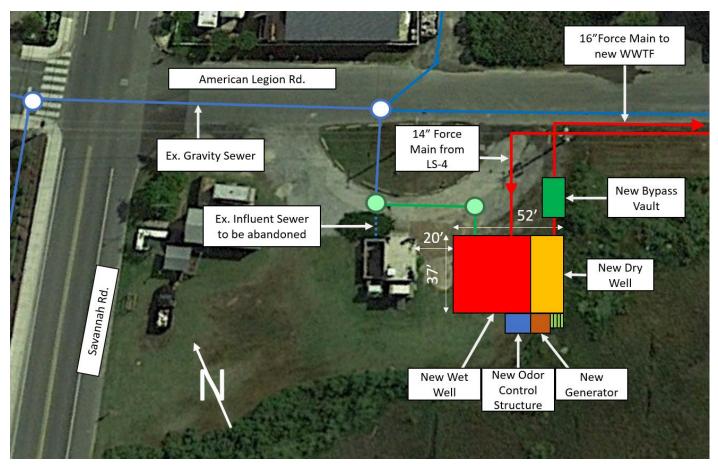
Options 2a/b/c, Raw Wastewater Pump Station, LS-8 Site Plan
